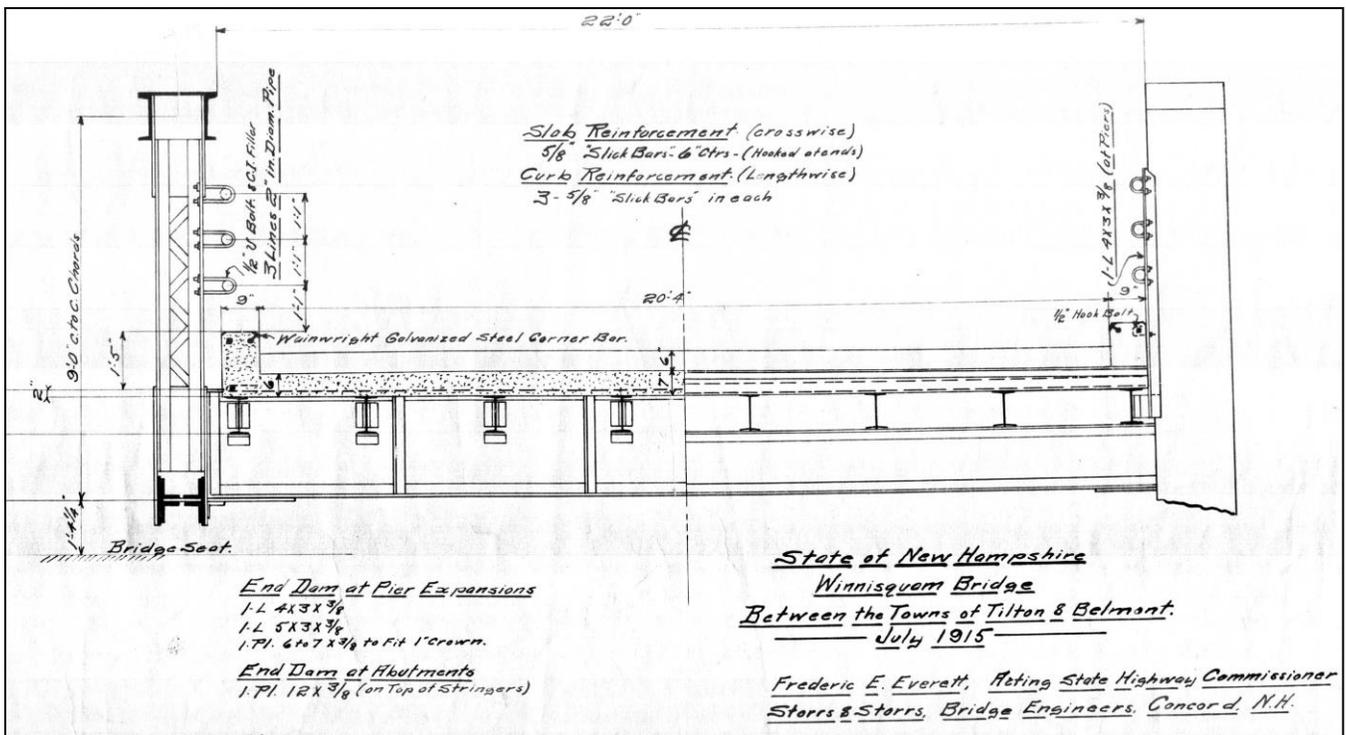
Belmont-Tilton 072/148, Winnisquam Bridge (1916). Original section drawing by Storrs & Storrs, Bridge Engineers, July 1915 (NHDOT Plan files).
